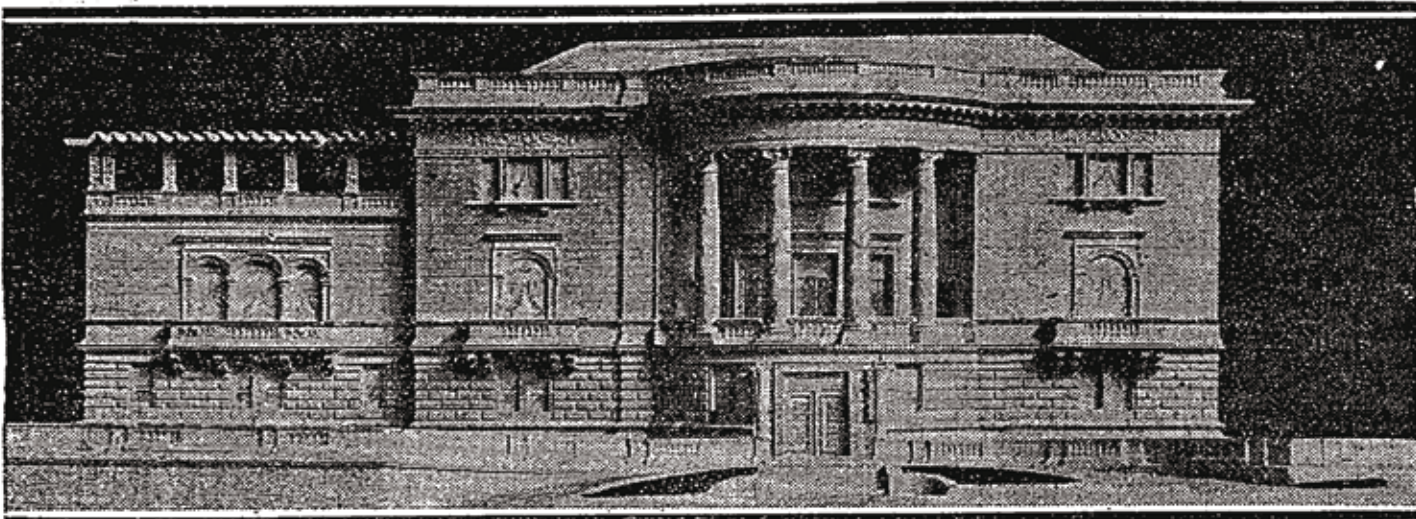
Projection plan for Everett House, Sheridan Circle façade – one of two existing drawings for the house, and showing the architect's signature (National Archives)
